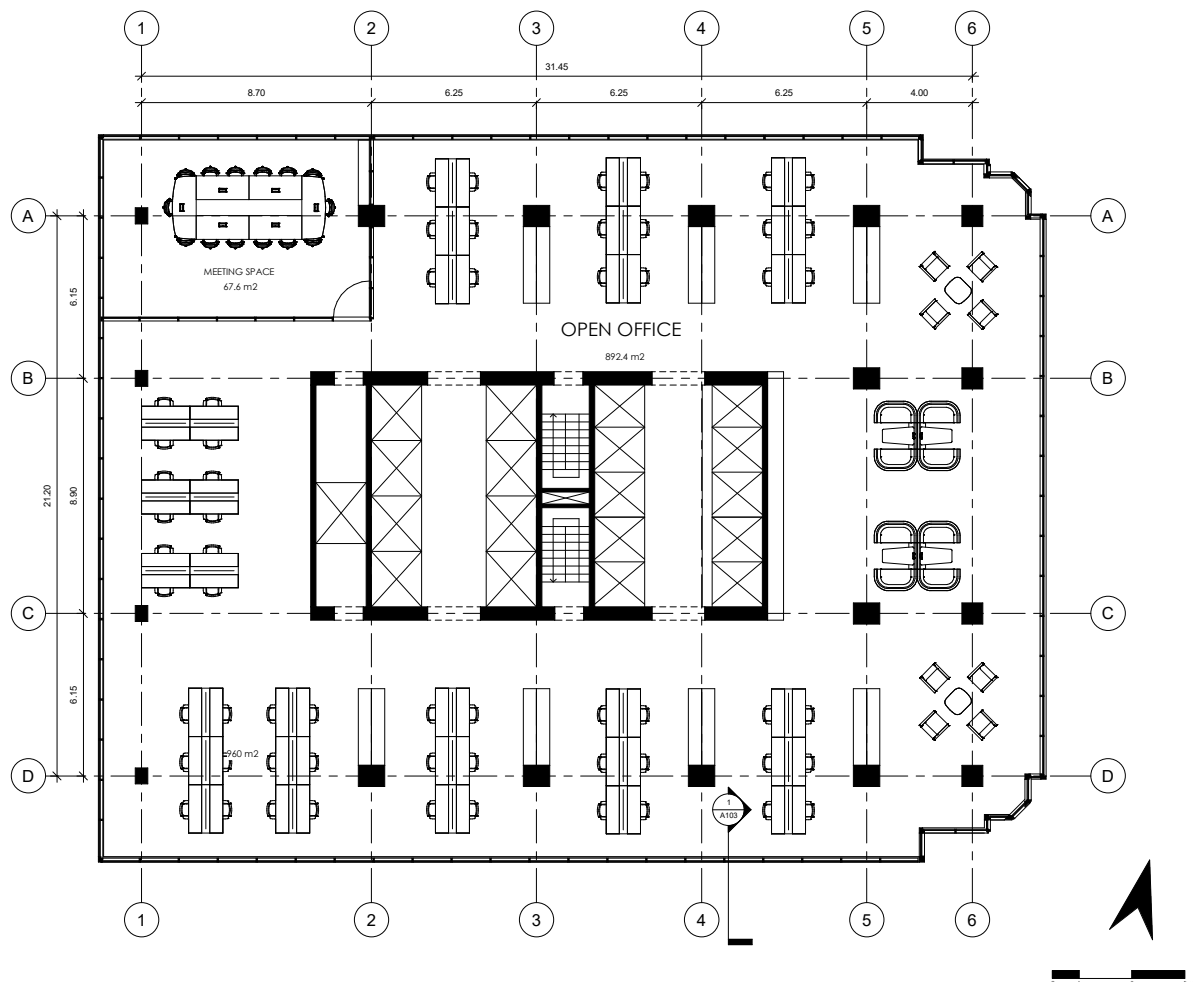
Koi Tower Open office, Type Floor. (redrawn by author)
